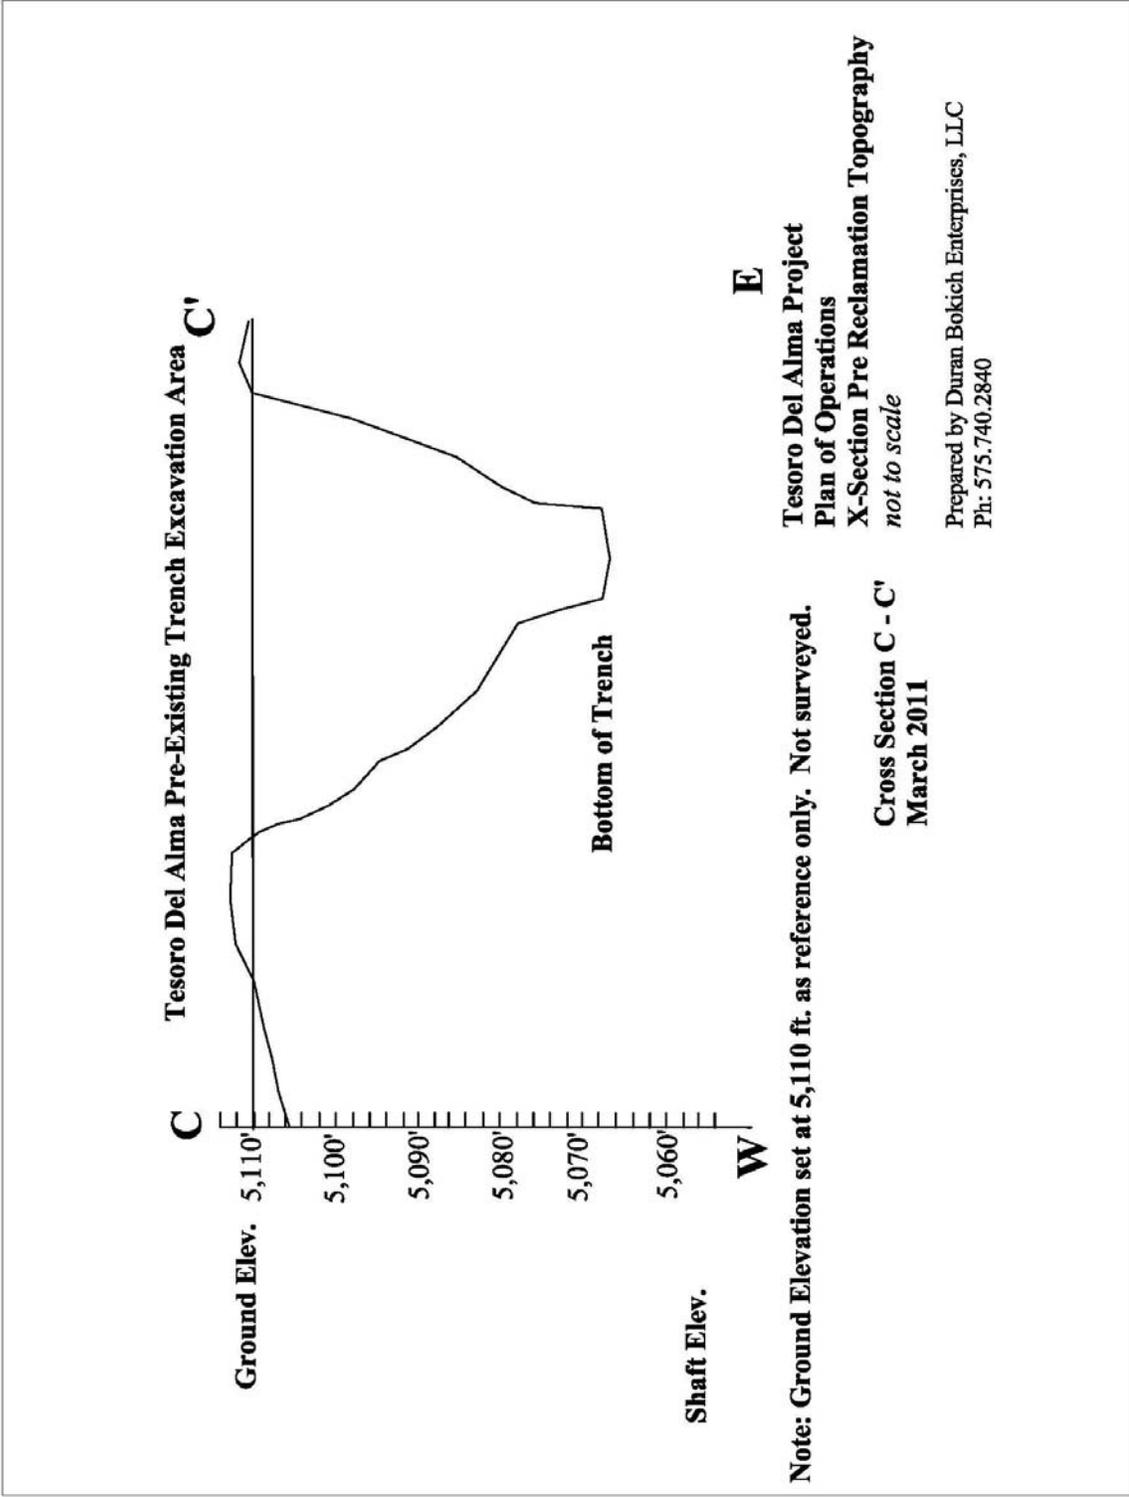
Appendix A. Pre-Existing Trench Excavation Area Cross Section.
